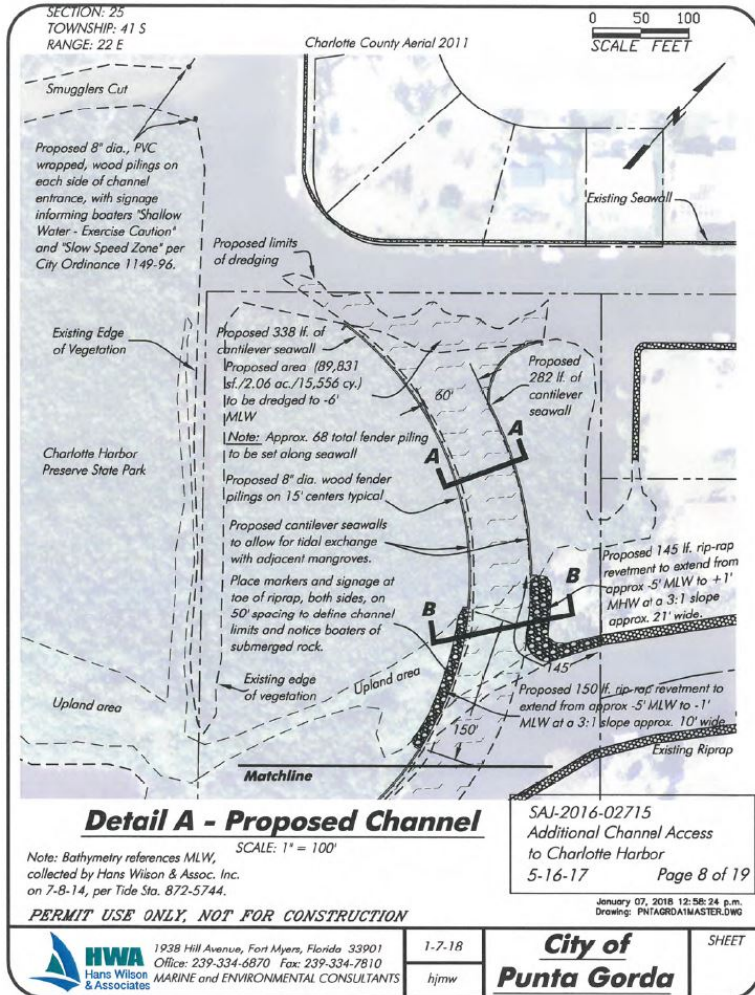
Detail A in Figure 1, showing the dredging/excavation, mangrove removal, cantilever seawall, riprap revetment, and aquatic enhancement along the proposed channel cut as well as the placement of piles at Smuggler’s Cut in River bay Canal (Image supplied by USACE).
